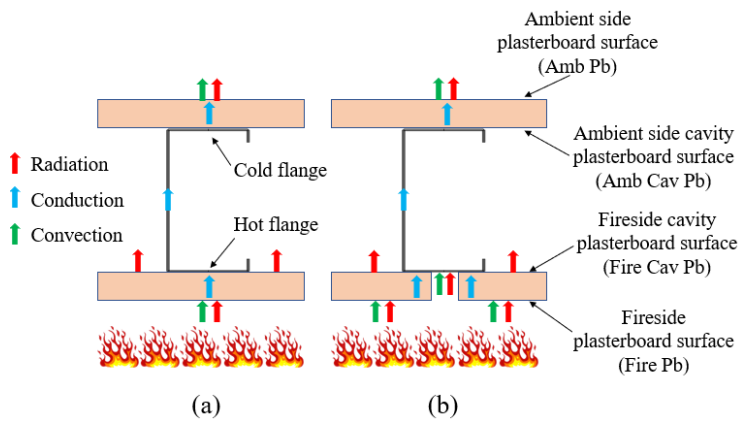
Heat transfer through LSF wall panel a) without and b) with plasterboard joint opening
